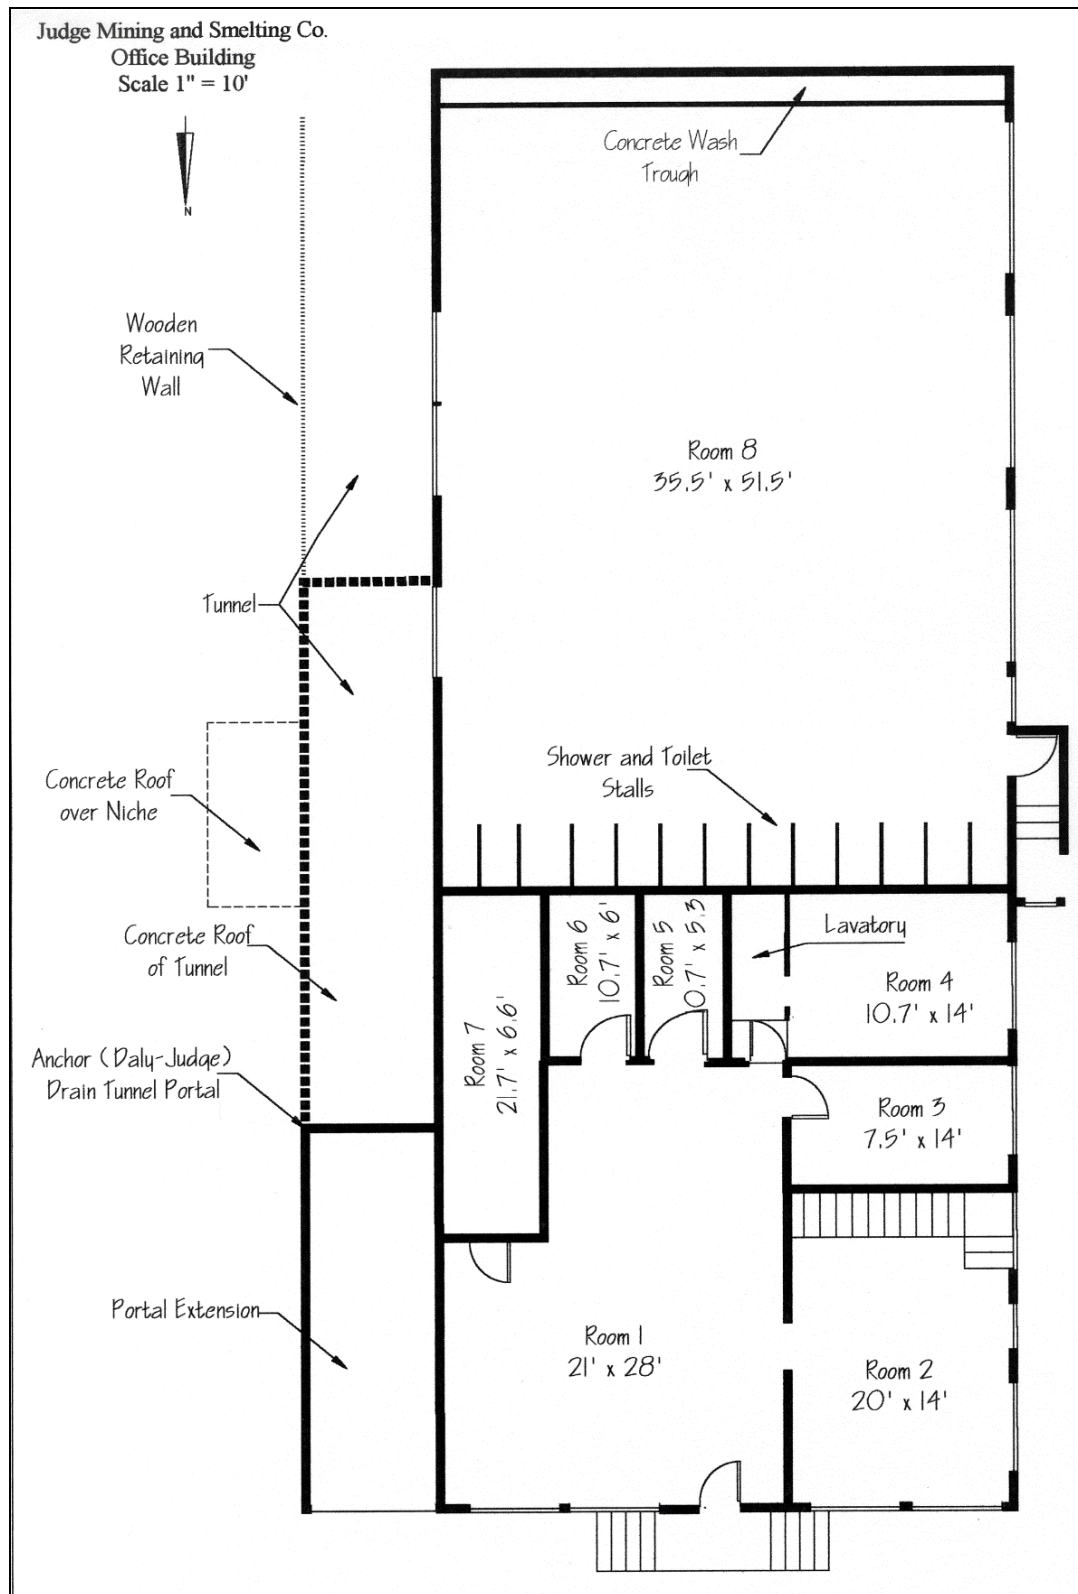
Floor plan (first floor), Judge Mining and Smelting Company Office building (from Bowes et al. 2000).
